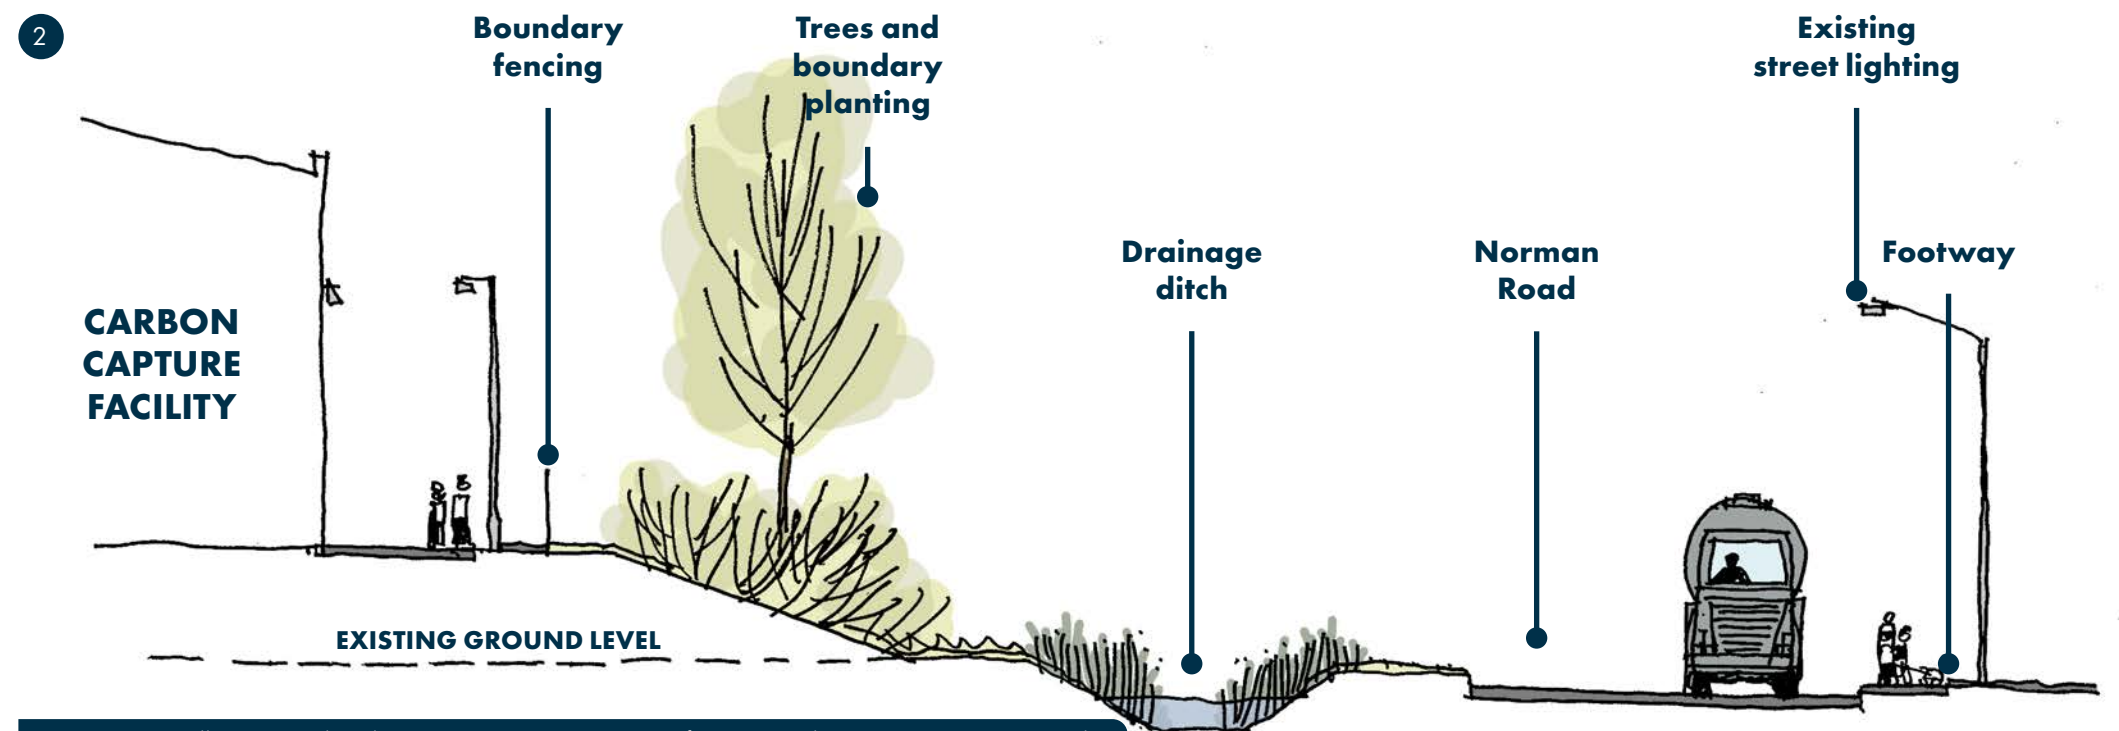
Illustrative sketch section - Cross section of CCF in relation to Norman Road
